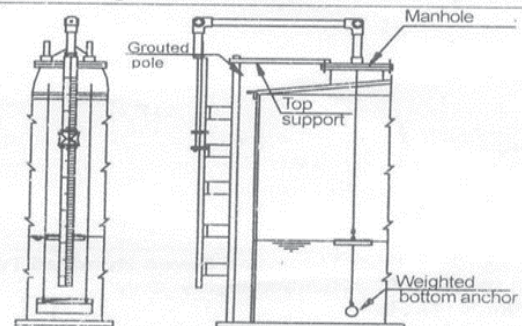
Mounting with Weighted Guide wire Anchor (Tank in Service).
